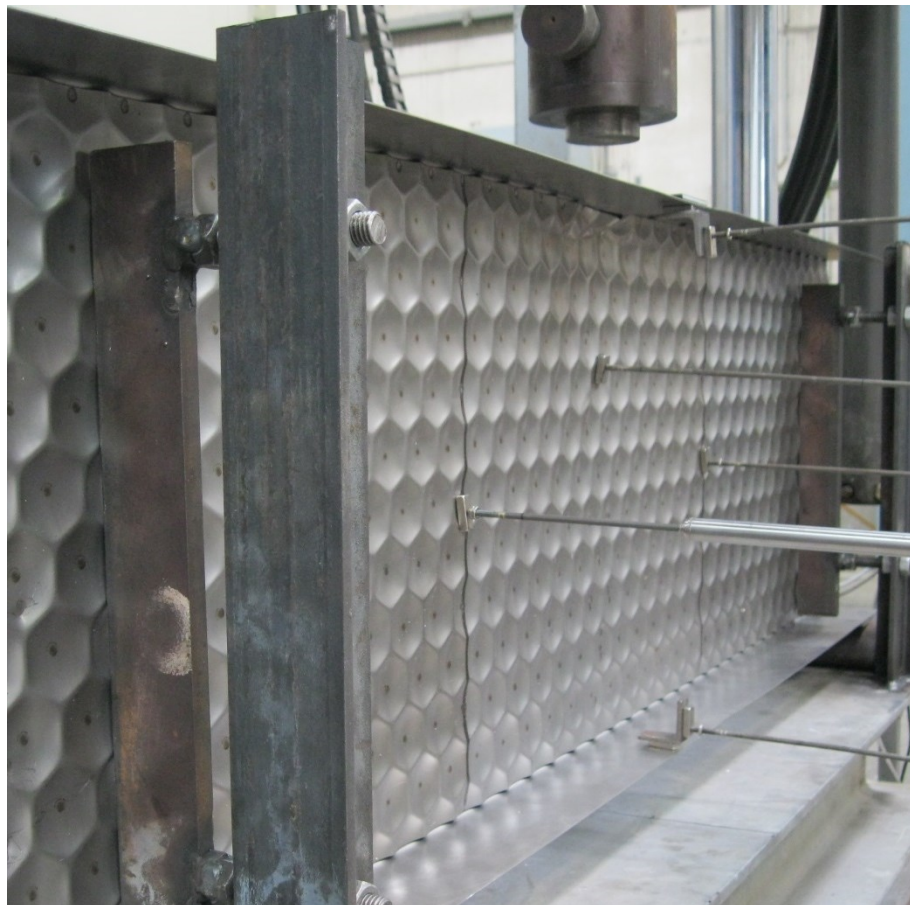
Beam 7 side view (flat 1.00 mm + structured 0.50 mm)
